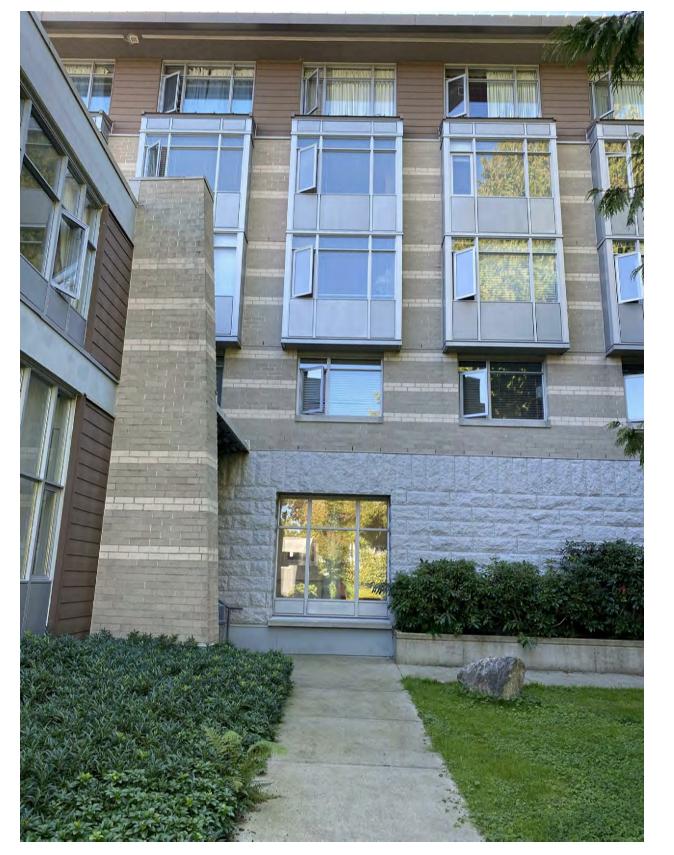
Carey Hall (Existing 2005 Building) - Typical Bays at Interior Courtyard
